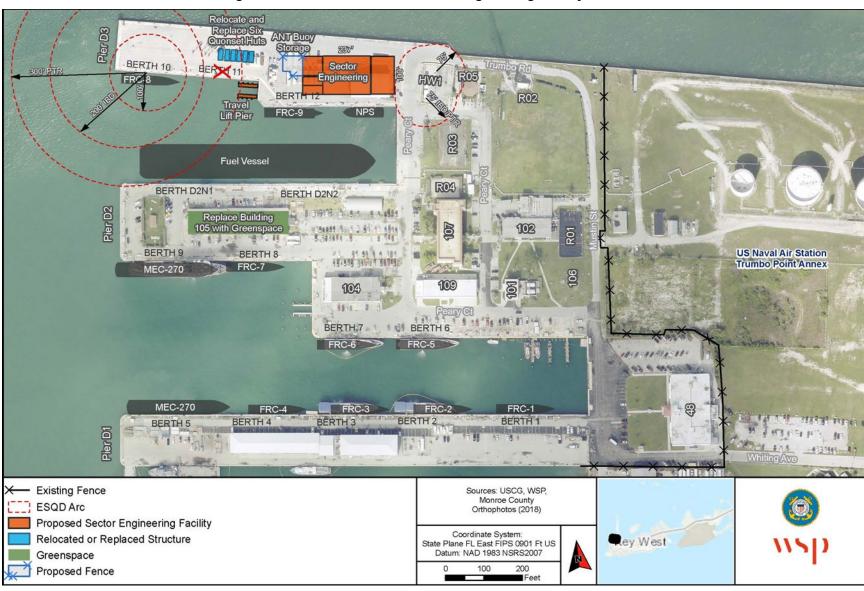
Alternative 2—Sector Engineering Facility Site Plan
